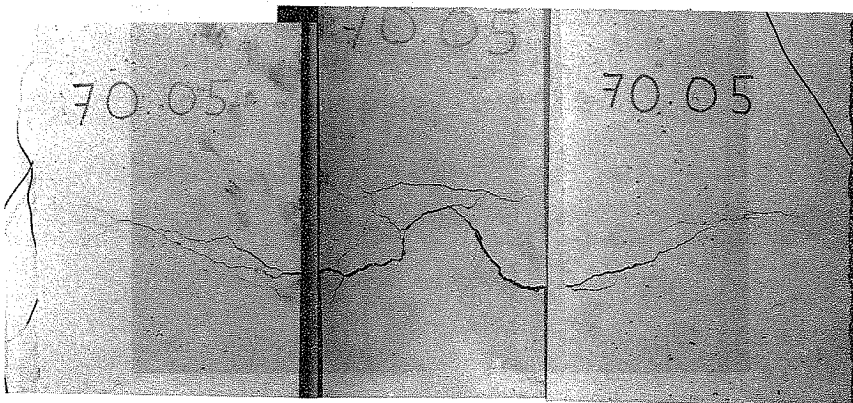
Failure of S.B.-specimen No. 70/05.
